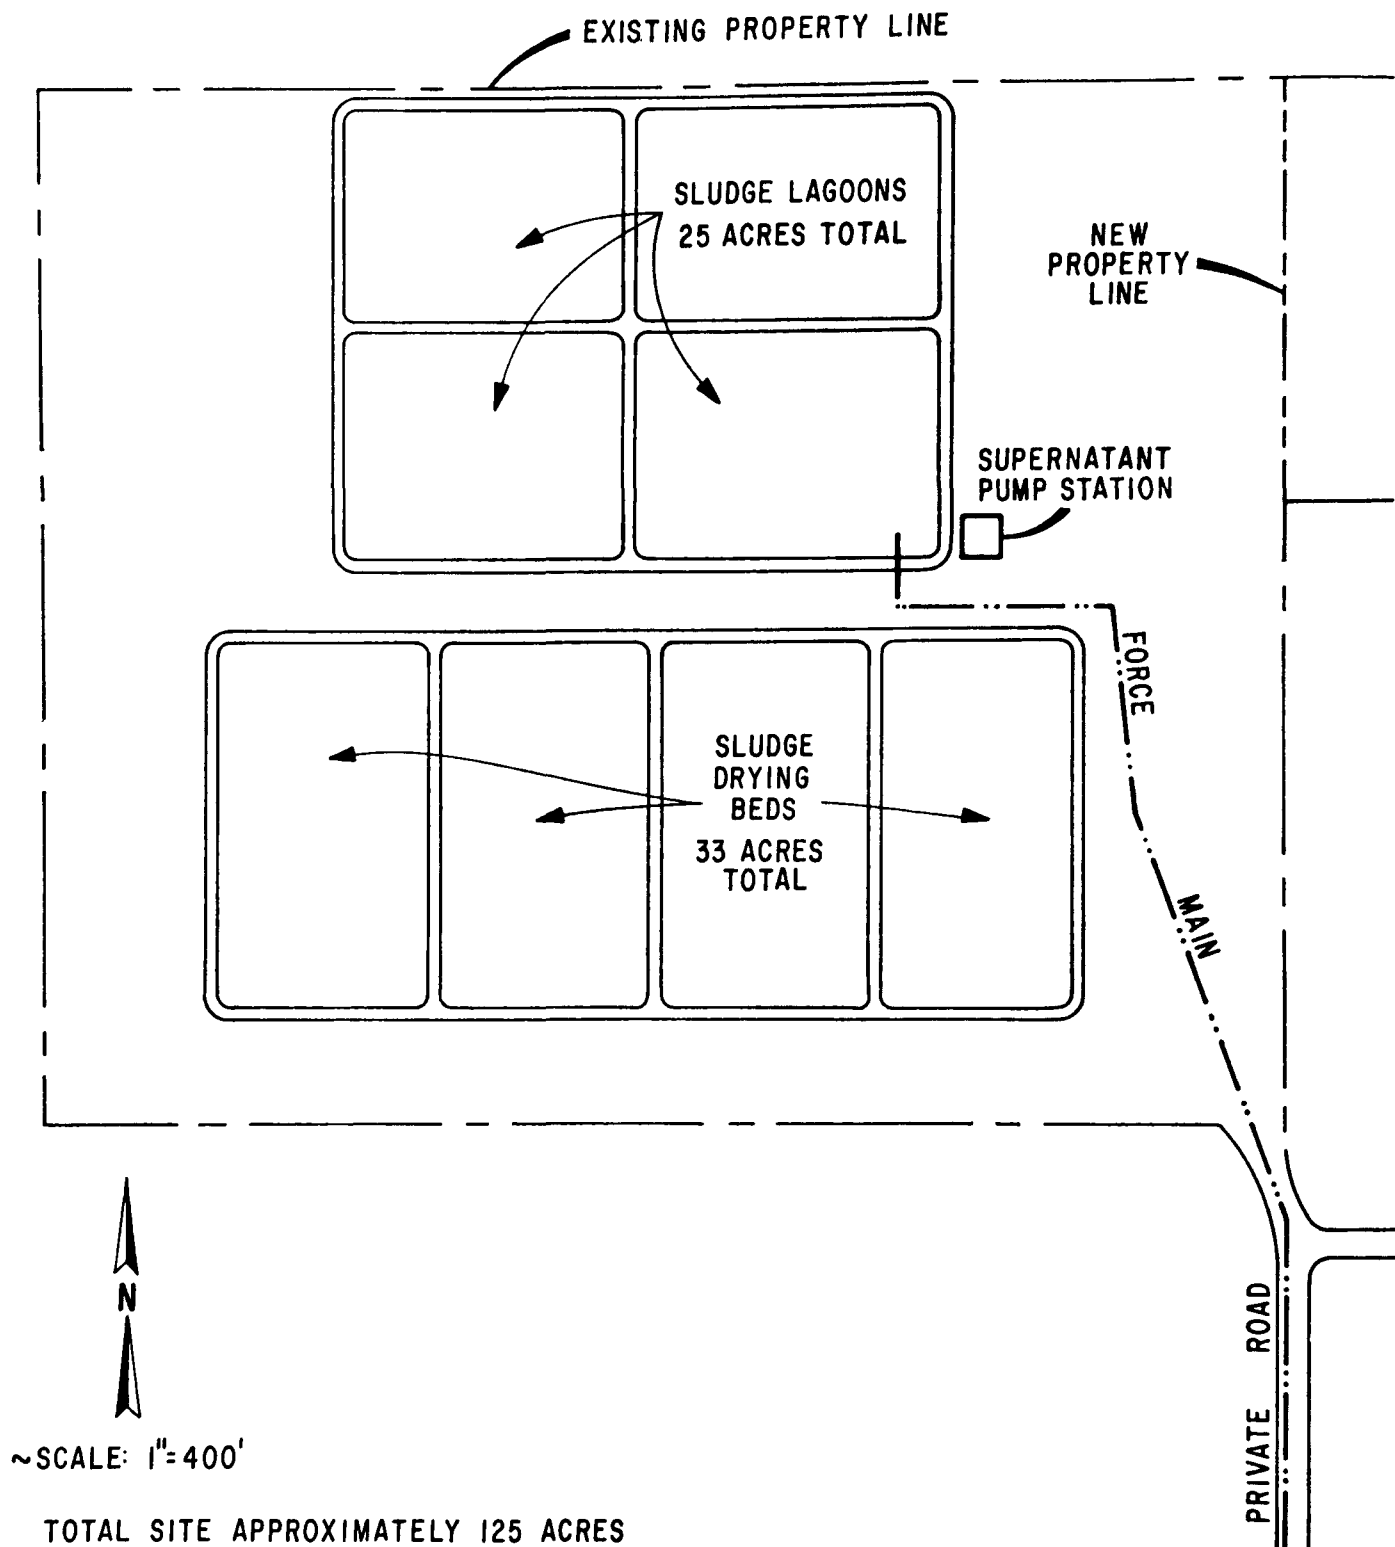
ALTERNATIVE 2 FACILITIES LAYOUT AT COBURG HILLS SITE
